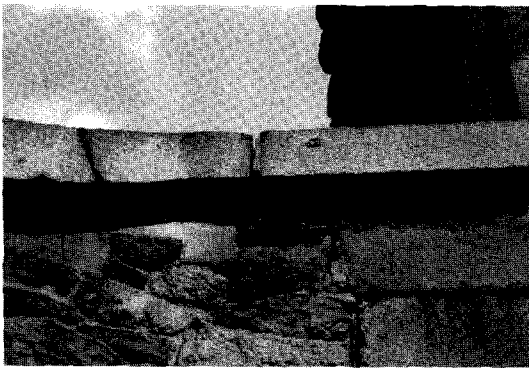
Contact between the west side of the south wall and the soil embankment.
